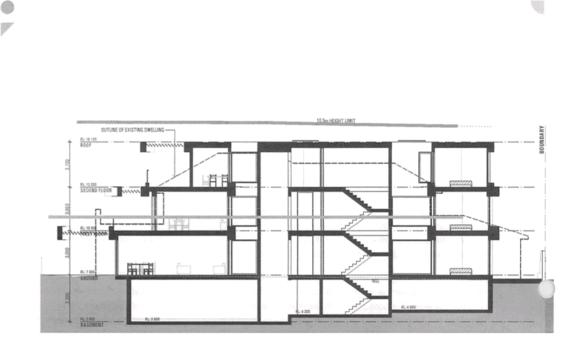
Section detailing the existing and proposed buildings with the two height limits
